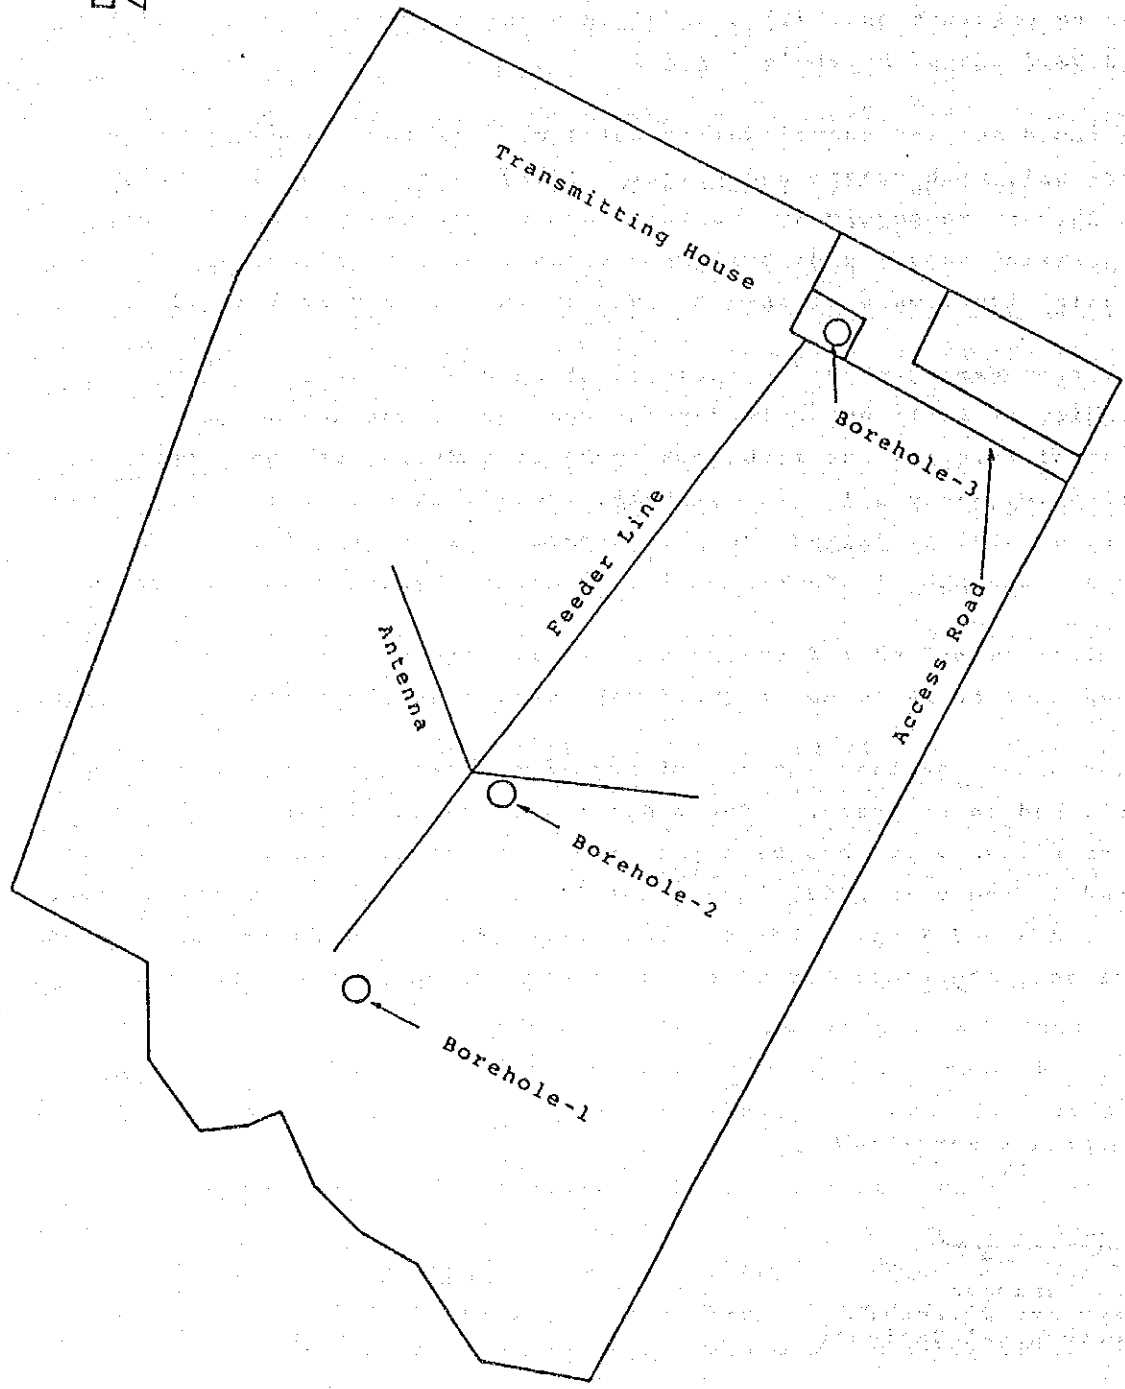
Site plan of Surkhet medium wave transmission tower station (Scale: 1/2500)
